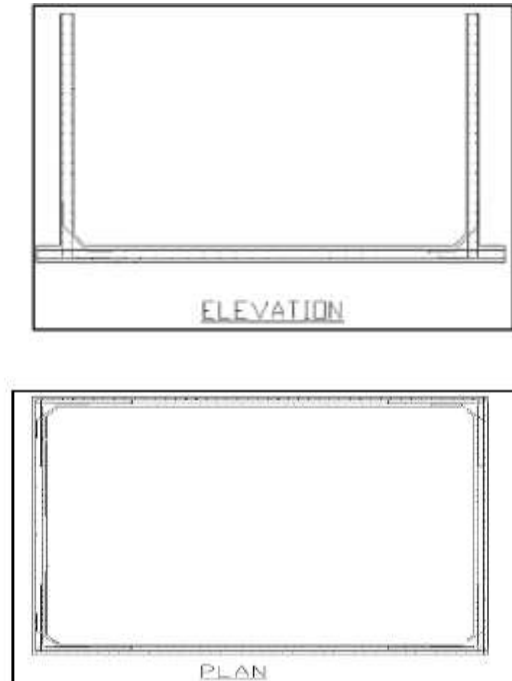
Rectangular Water Tank resting on ground shows reinforcement detailing ideas
